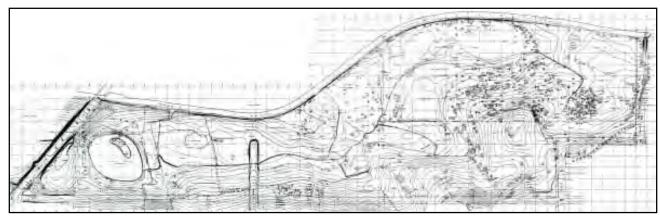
Topographic Survey between Bloomfield Avenue and Fredonia Avenue [Heller Parkway], Plan #2121-10, sheet 2. Source: ONHS.
